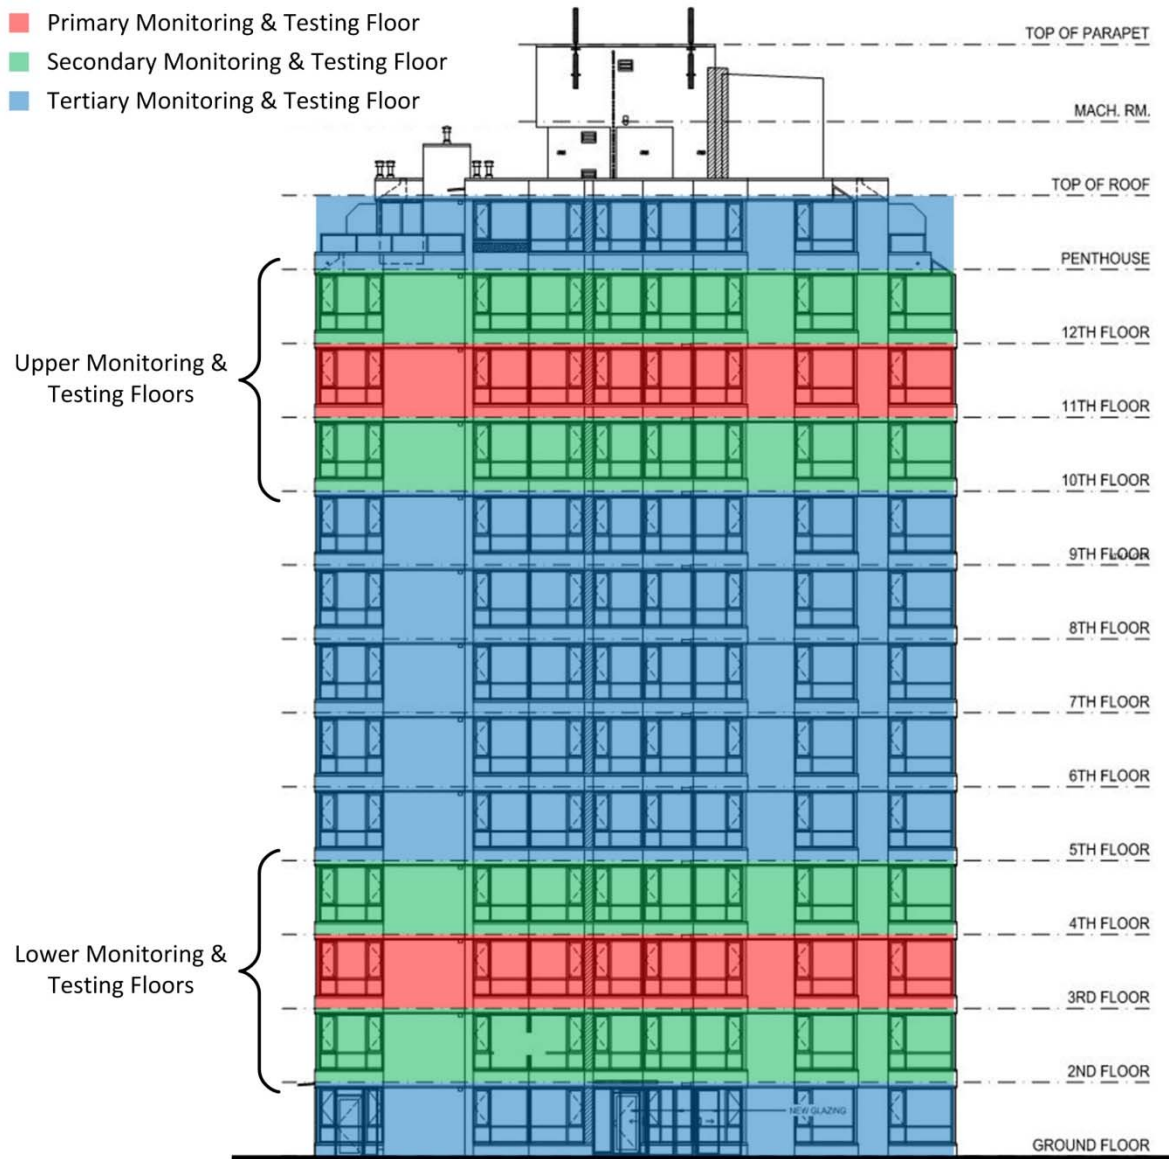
West elevation of the case study building indicating the primary, secondary, and tertiary monitoring and testing floors
